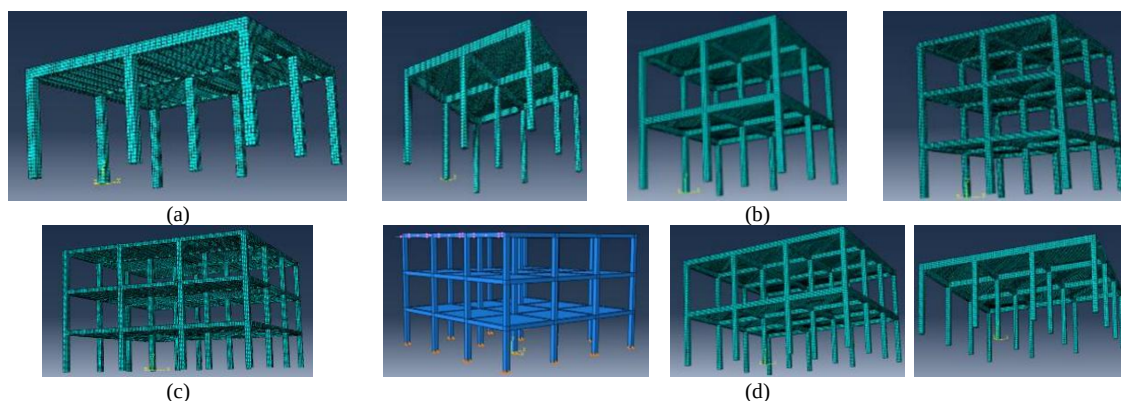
Frame models in ABAQUS: (a) 2-span 1-story with roof with AAC components; (b) 2-span with equivalent Inteldeck roof; (c) 3-span 3-story with roof with AAC components; (d) 3-span with equivalent Inteldeck roof
